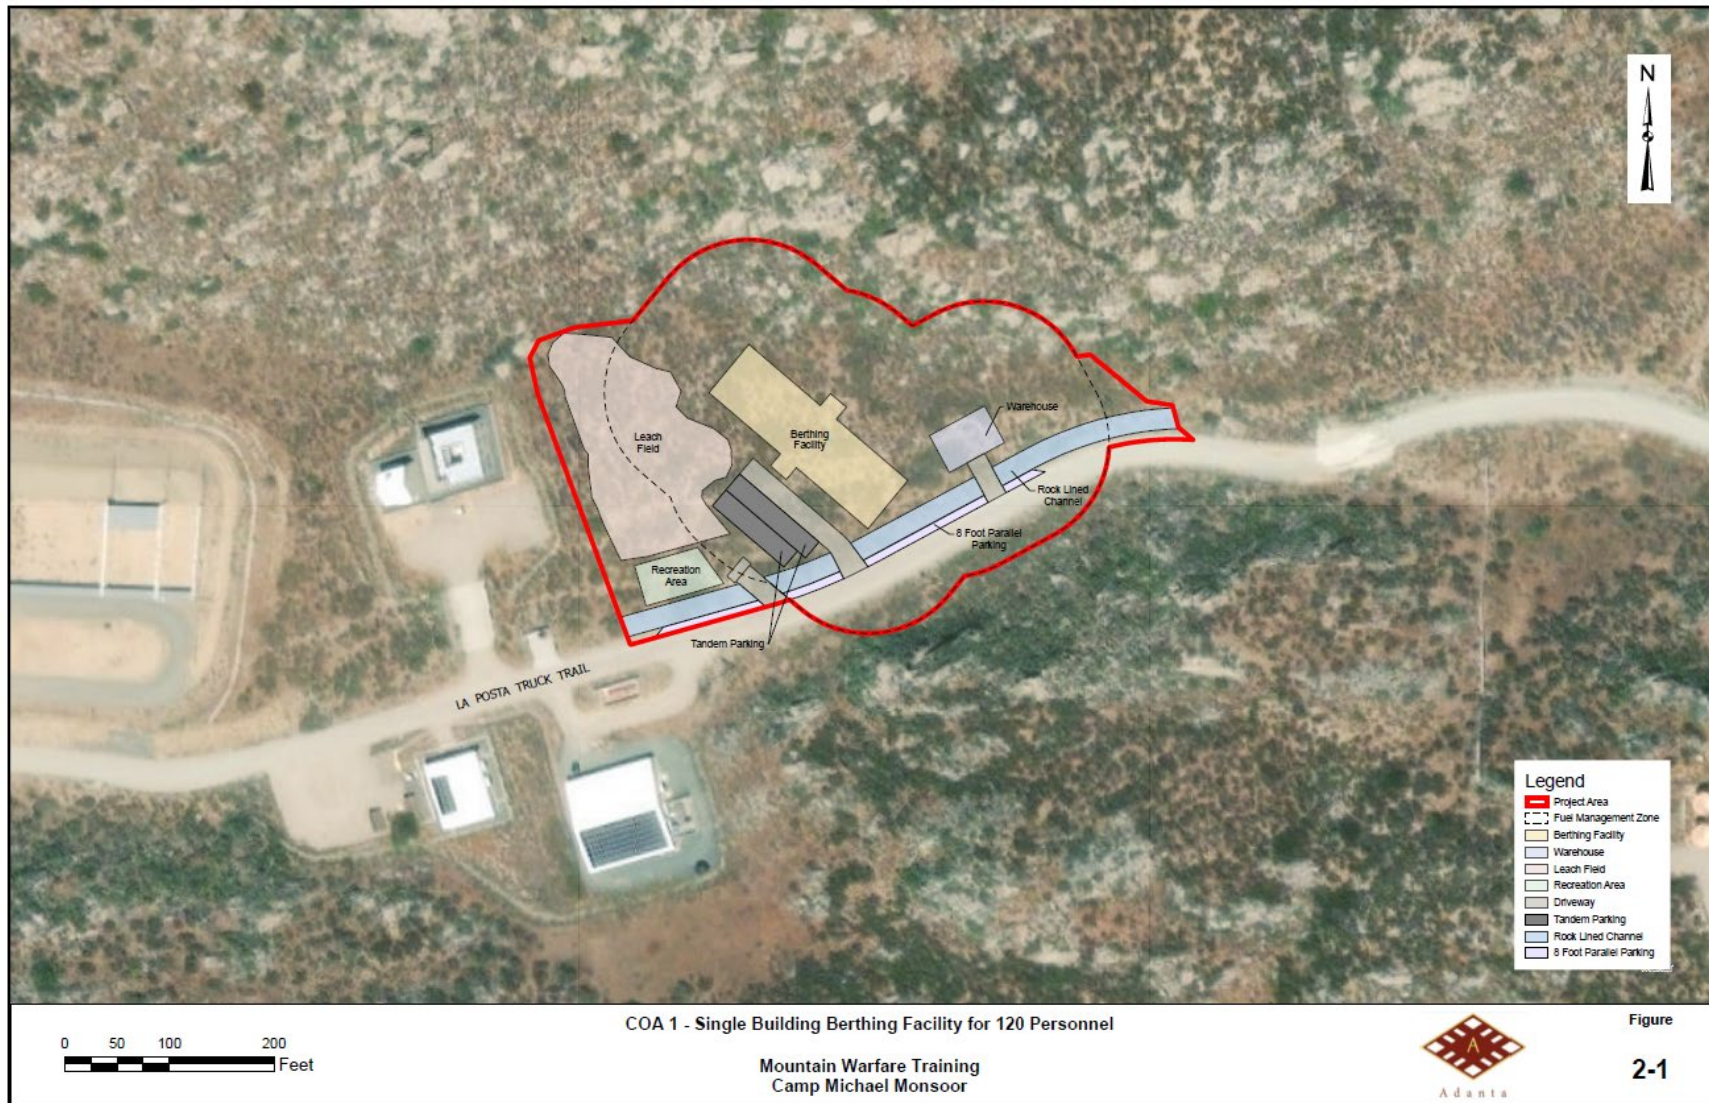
Proposed Action – COA 1: Single 120-person Building
